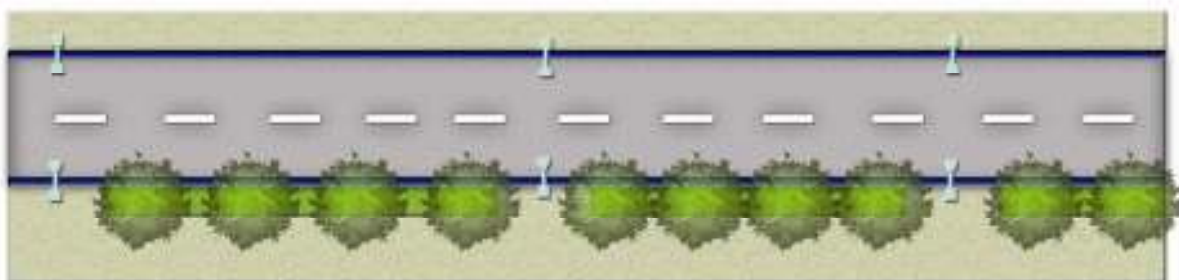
One-way-street with only one sideway to have wider sideway to be able to have opportunity for plantation.
